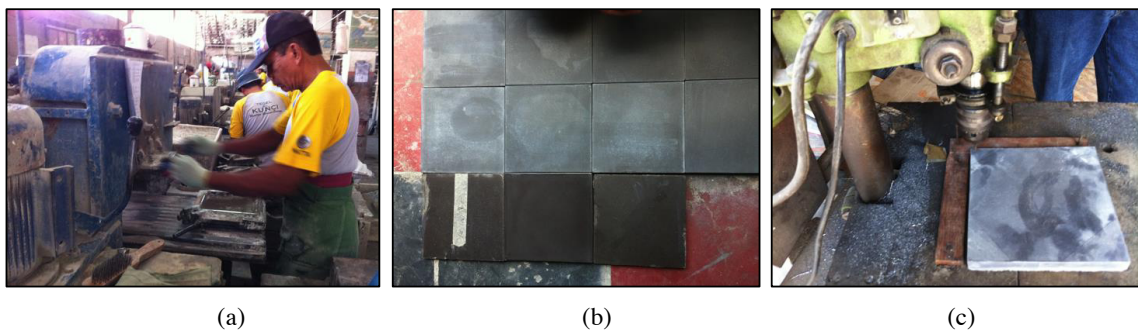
(a) the reproduction of similar floor tiles; (b) comparing the original floor tiles with the replica; (c) a hole was made on the replica floor tiles
